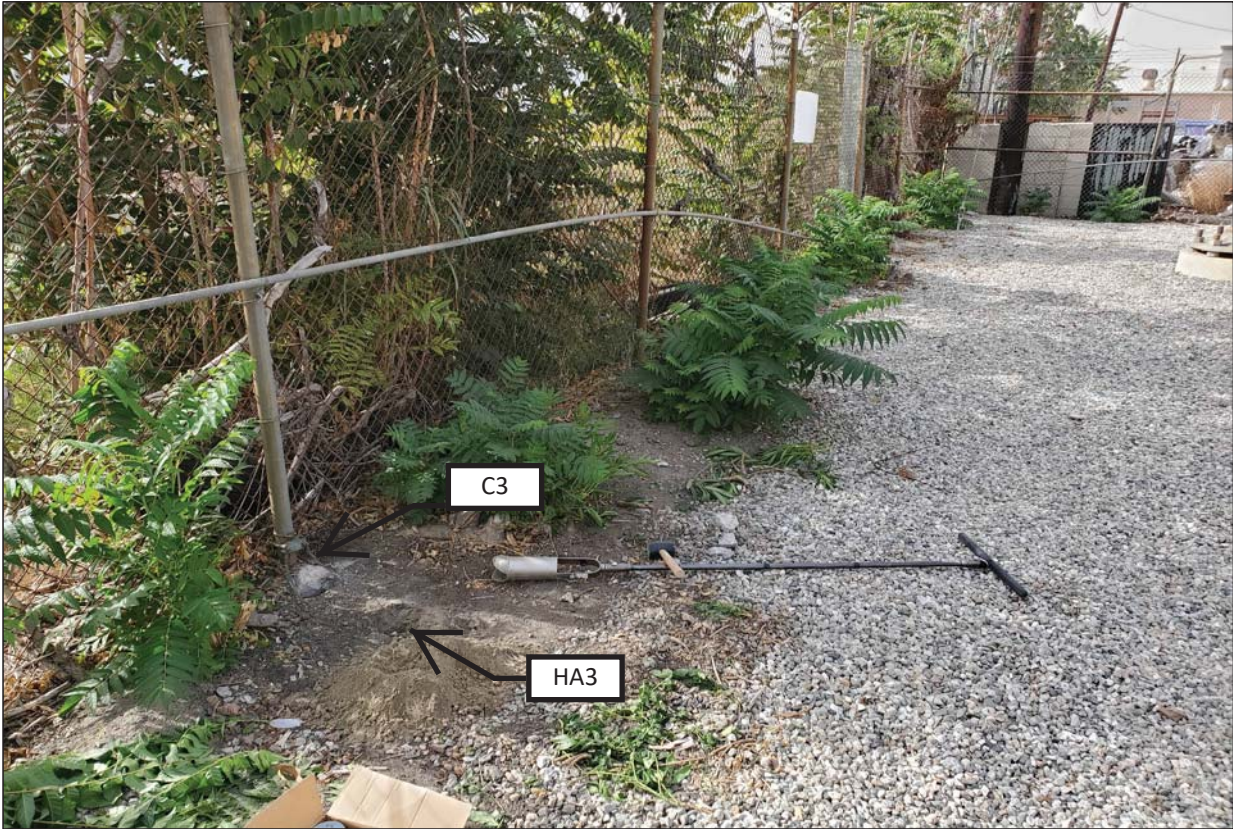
HAND AUGER LOCATION HA3 AND CONCRETE SAMPLE LOCATION C3
